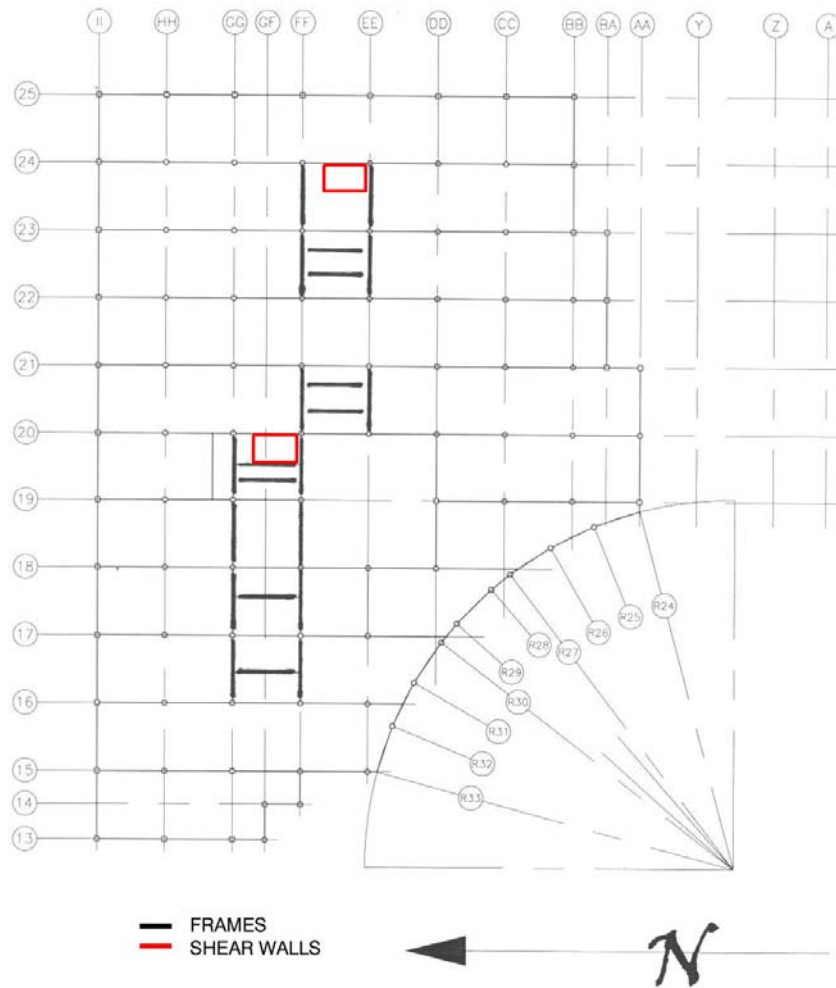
Proposed shear walls at stairwells overlaying existing frame system
